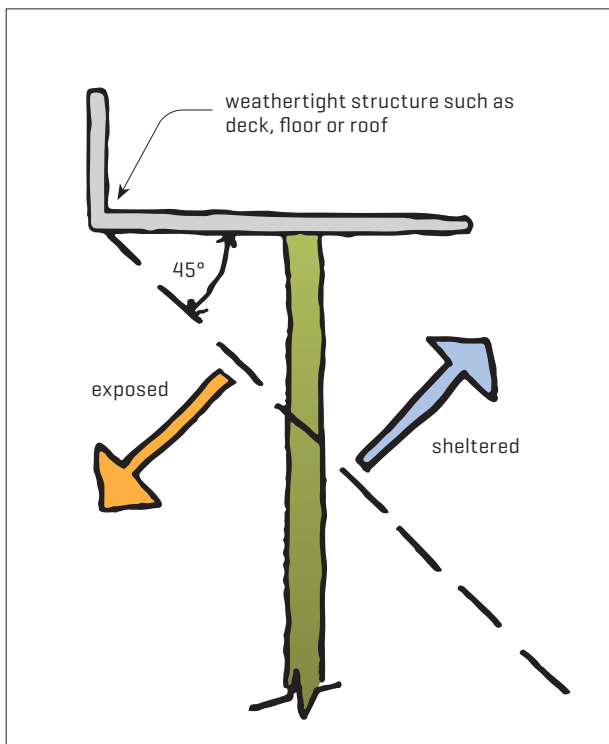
The definitions of sheltered and exposed as given in NZS 3604:2011 *Timber-framed buildings*.
